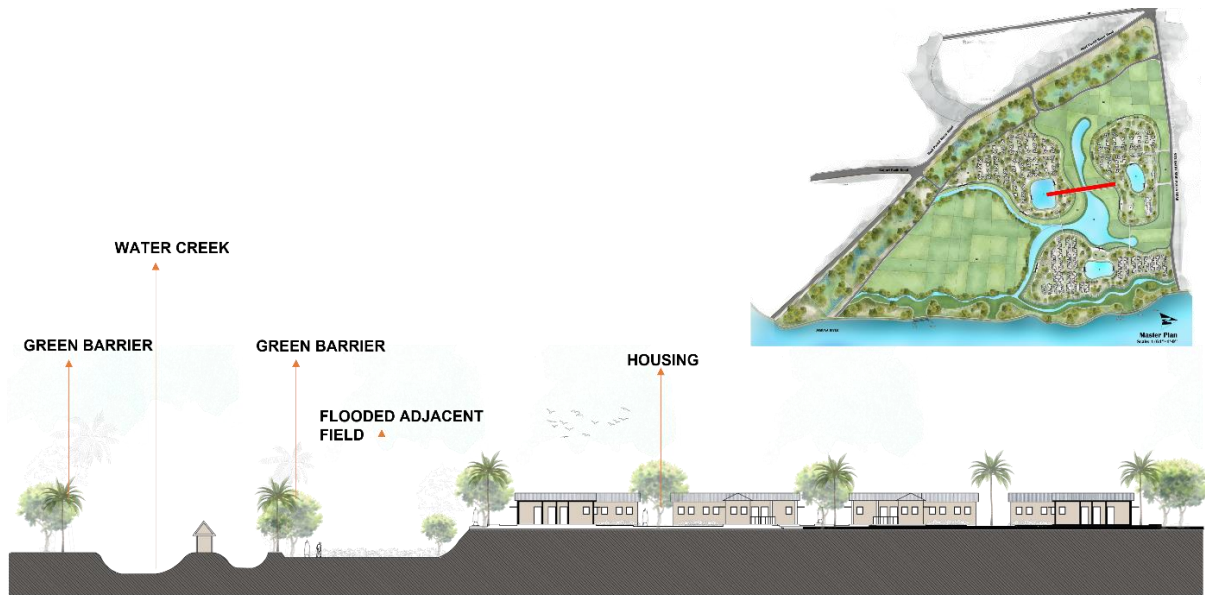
The small and narrow water creek design will drain the surface run water, making them slow and storing water for farming the land.
